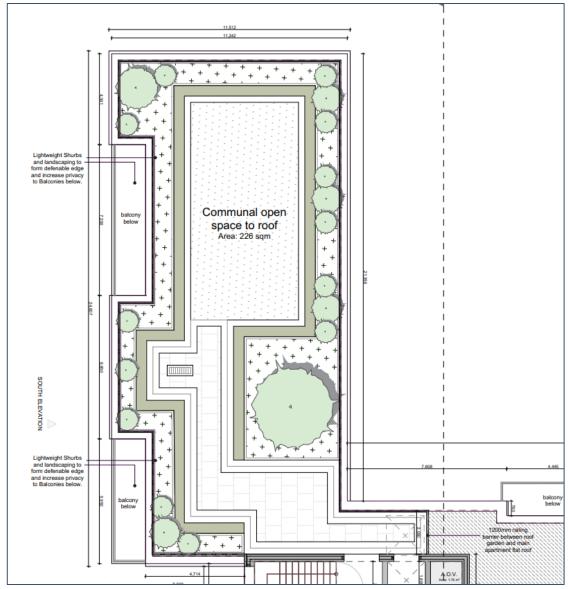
Communal Roof Space to Apartment Building – extract of drawing 20175-3026
